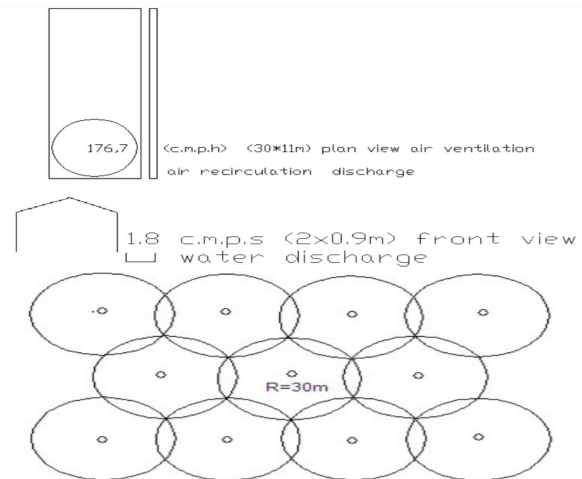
Sanitary drawings that are useful for ventilation demand control at indoors for particular monitoring schemes at buildings and maintenance of construction facilities for public health protection.
